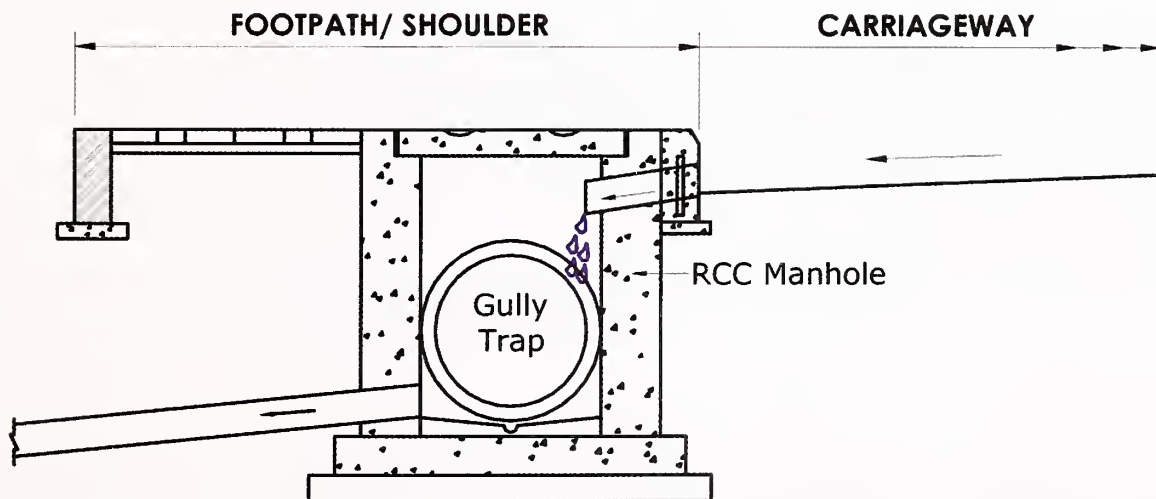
Arrangement of Providing Pipe for Collecting and Disposing Water
